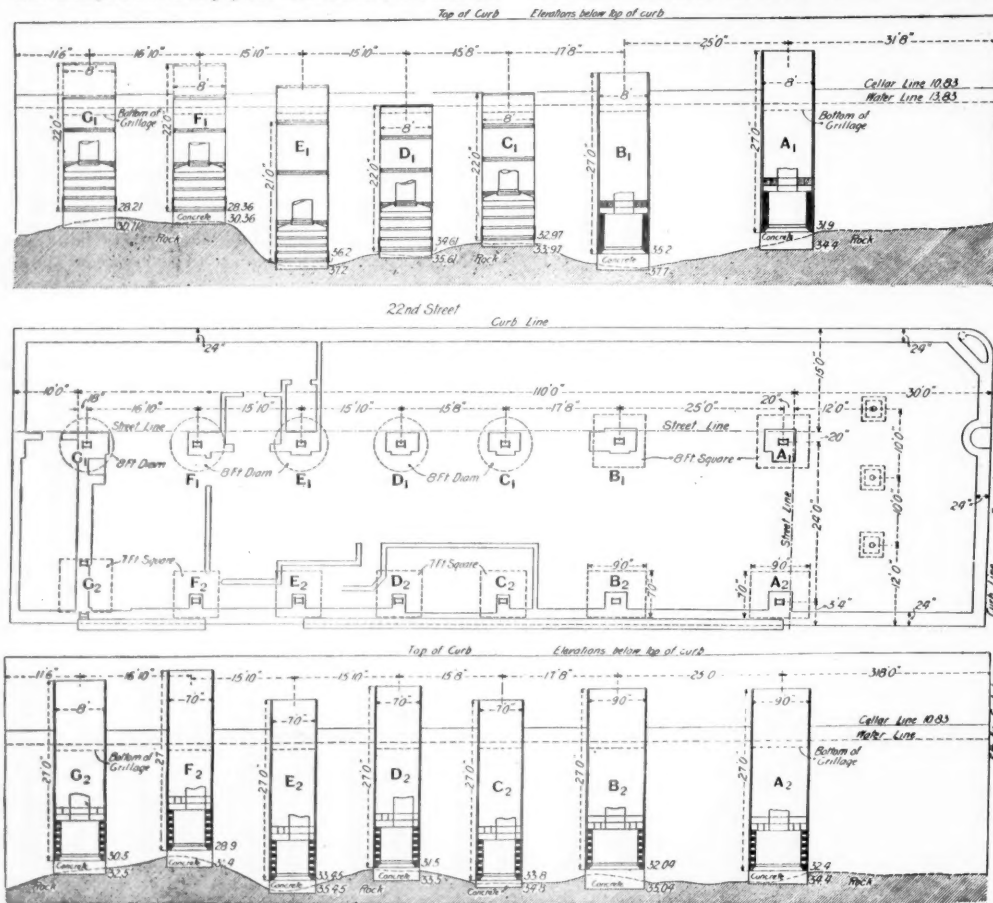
Plan and Sections of Foundations for Mercantile Building.
